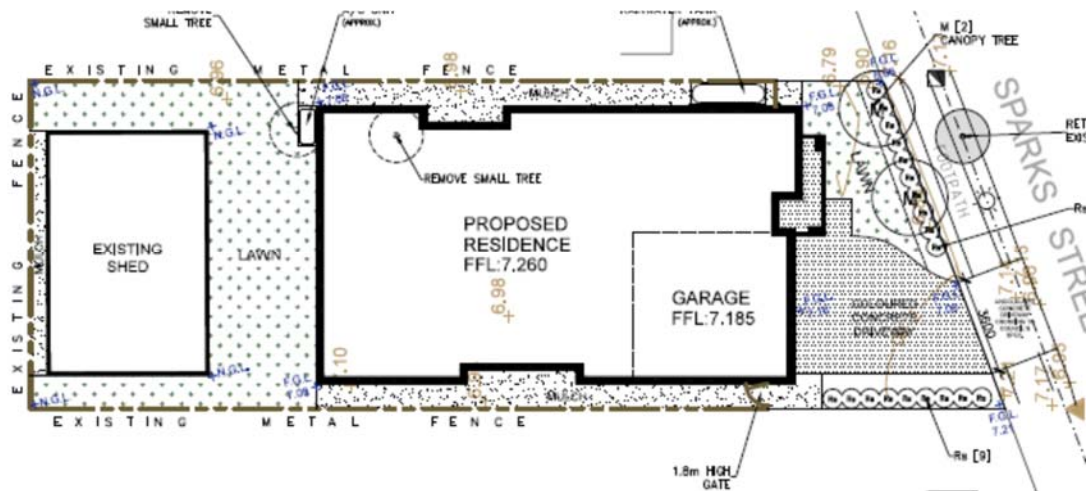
Proposed Site plan of the new approved dwelling with the existing rear outbuilding conditioned to be demolished.
